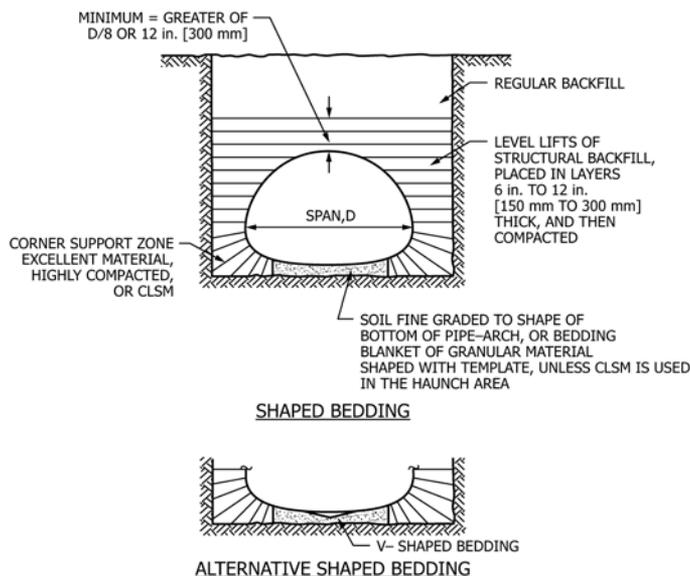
Bedding and Corner Zone Treatment for Pipe-Arch Structures
